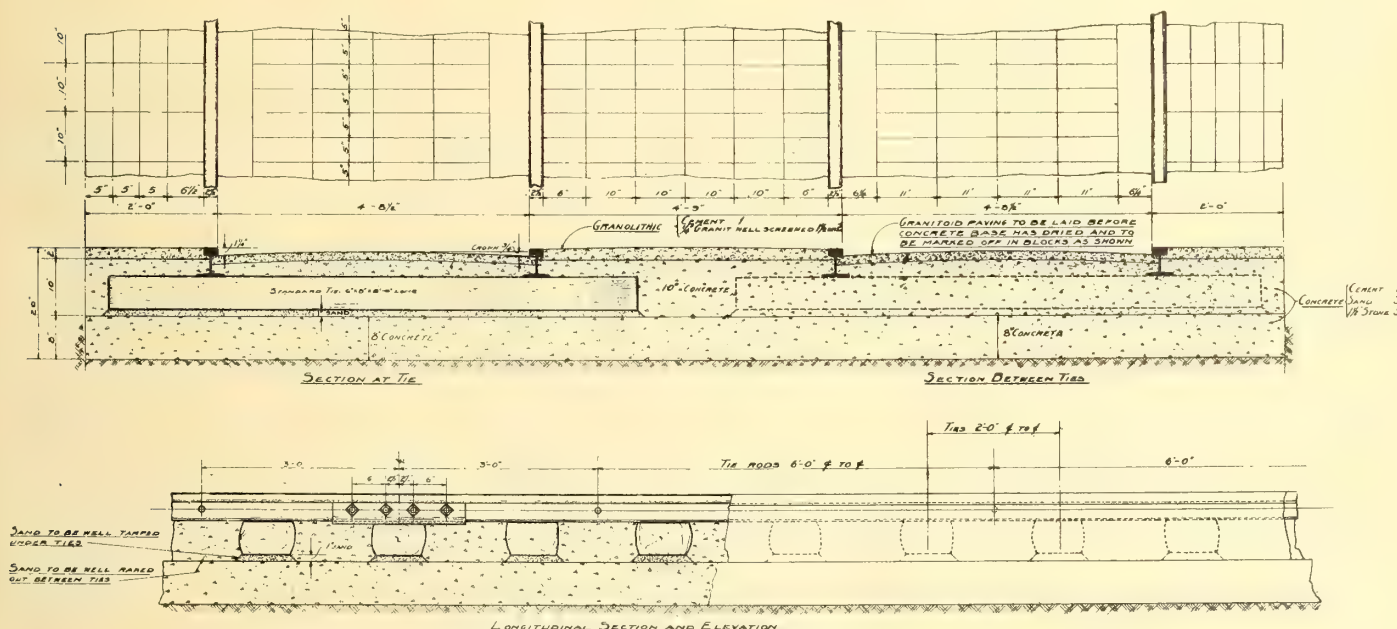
Concrete Slab Construction provides a more flexible foundation
